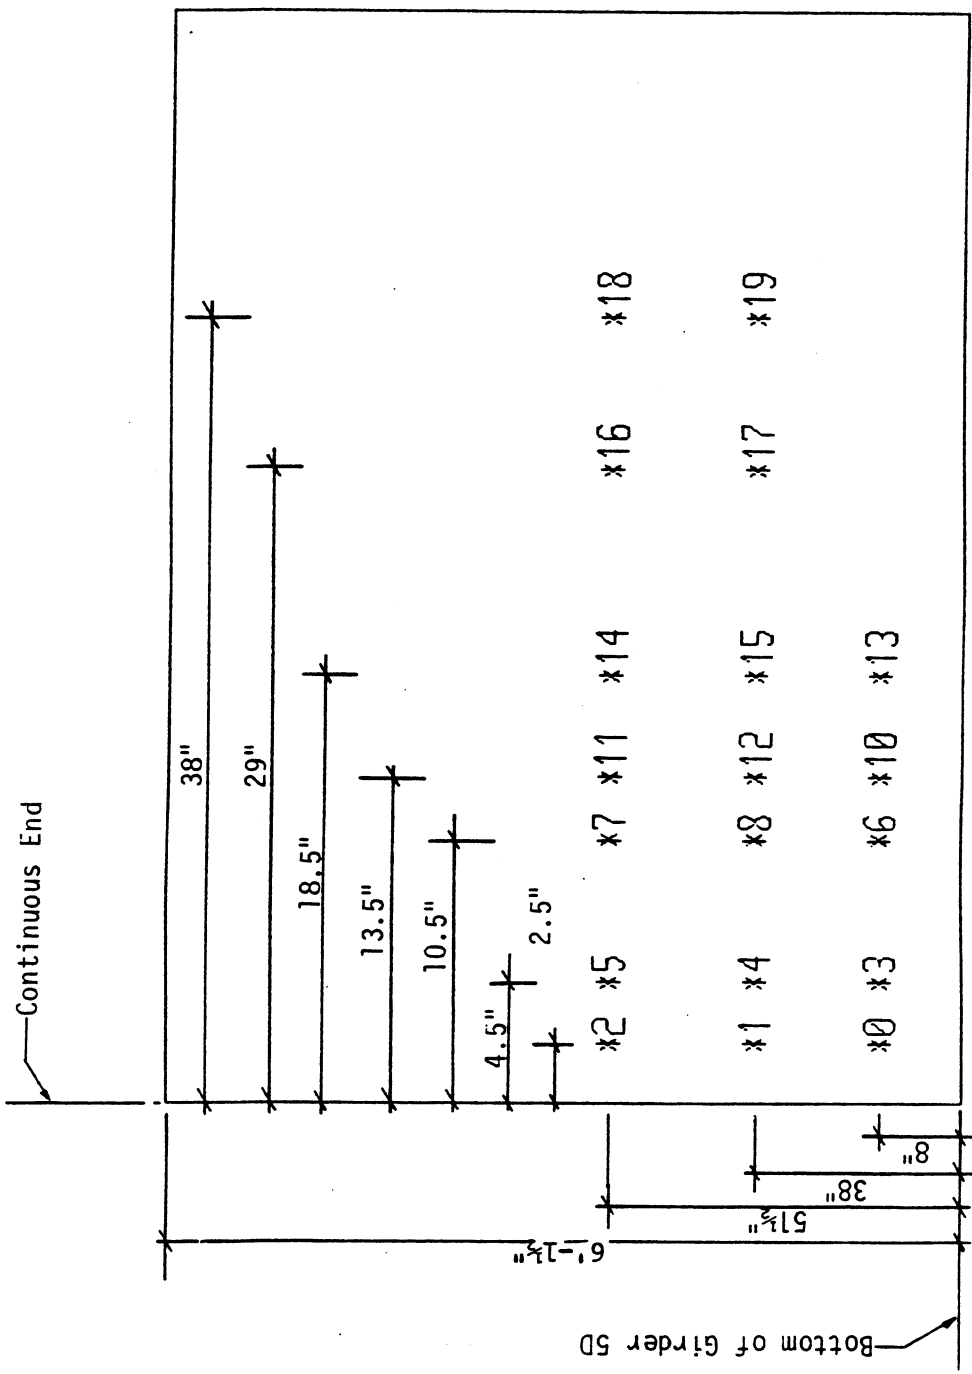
a Field Test - Configuration of Strain Gages on Stirrups of Girder 5D
